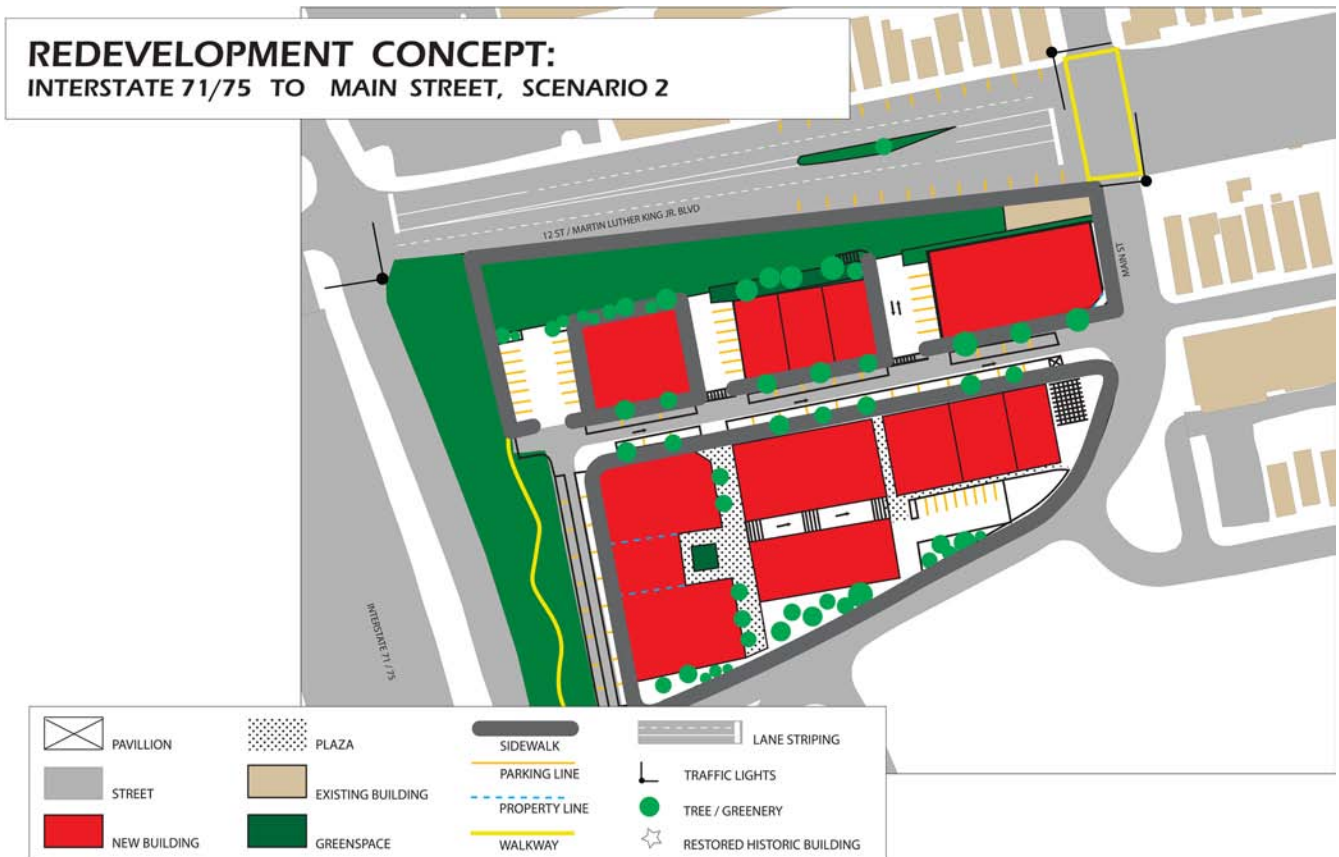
Redevelopment Design Concept - Interstate 71/75 to Main Street
